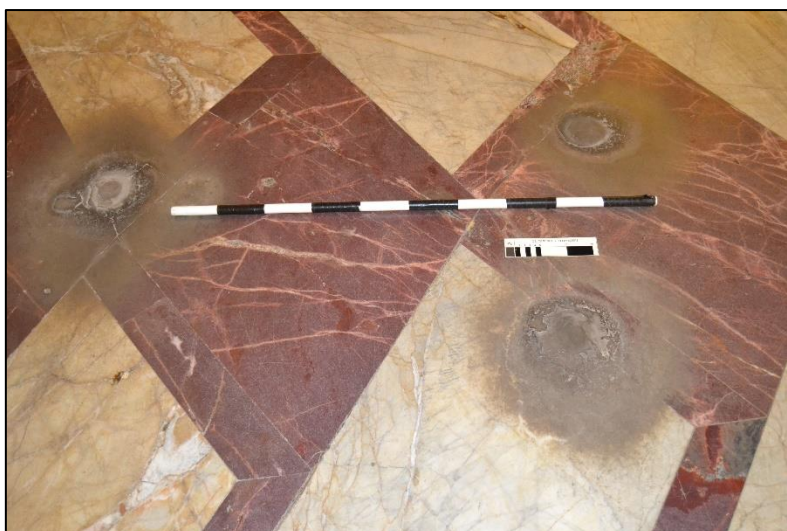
Dark patches on the floor along the southern side of the interior where dripping water caused colouration and slow disintegration of the floor tiles (scale bar – 1m long) (Photograph: M. Naudé 2020)
